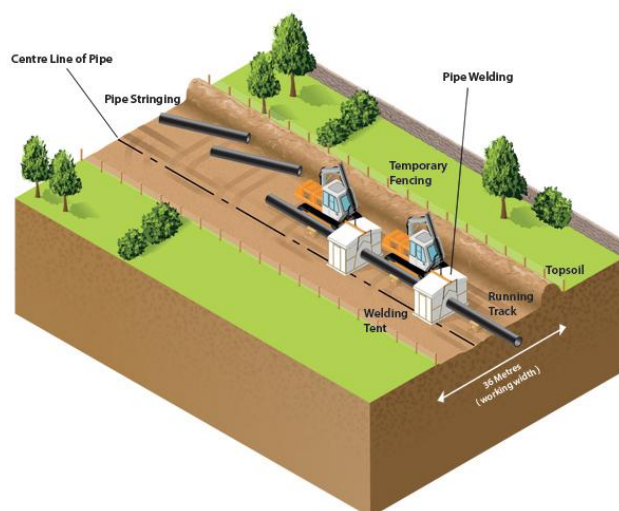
Illustration of Pipe Sections being Welded Together
